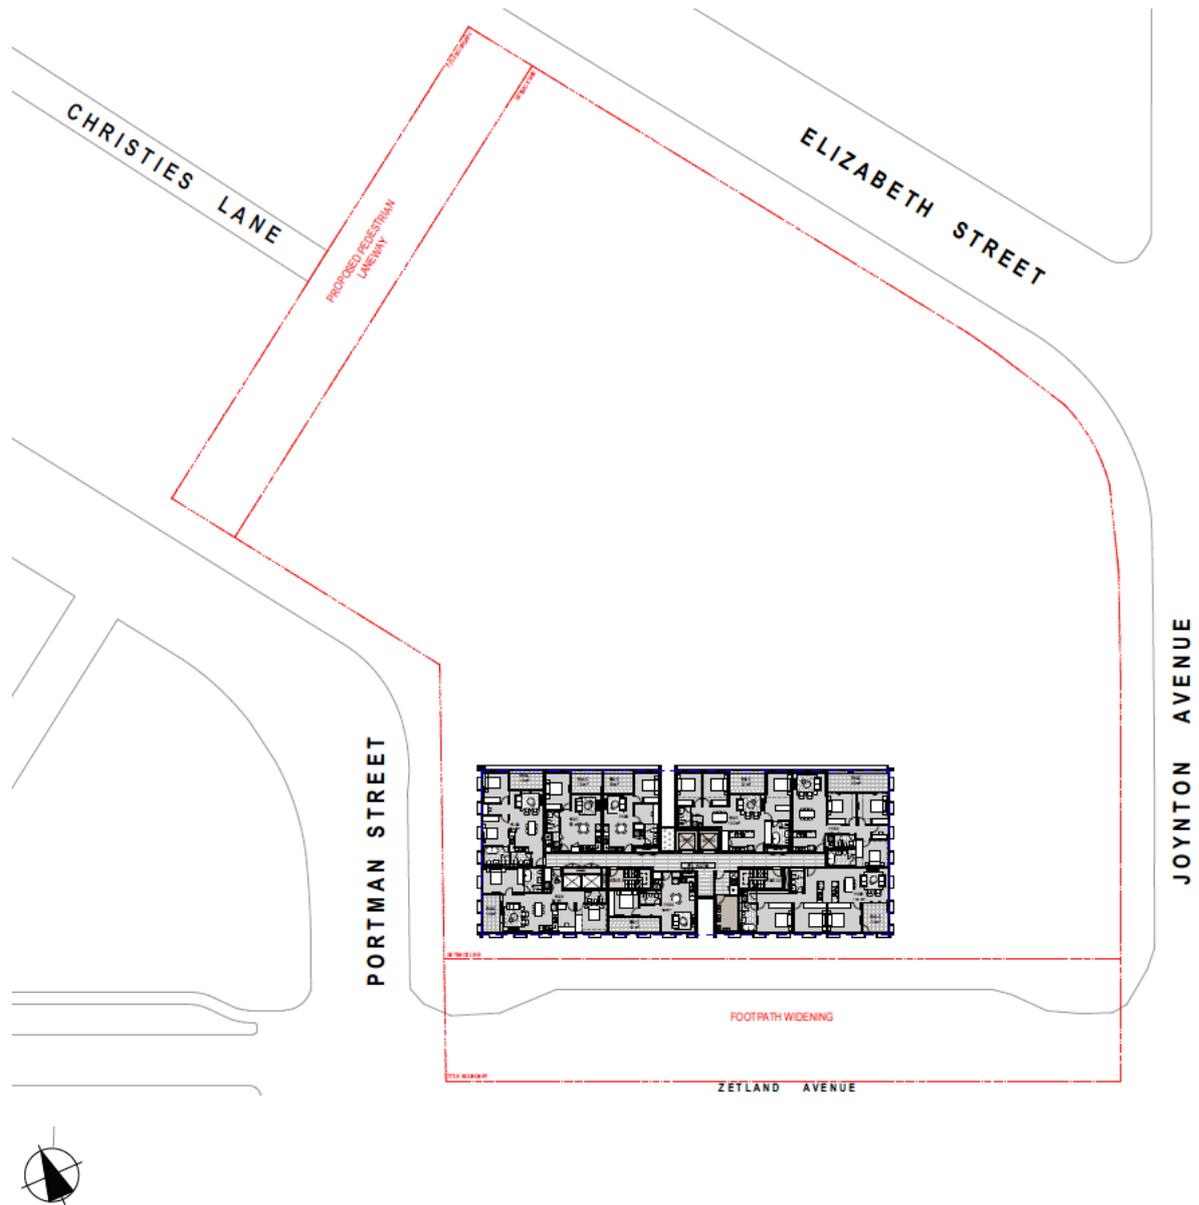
Proposed Level 11 Plan (Level 12 & 13 similar)
